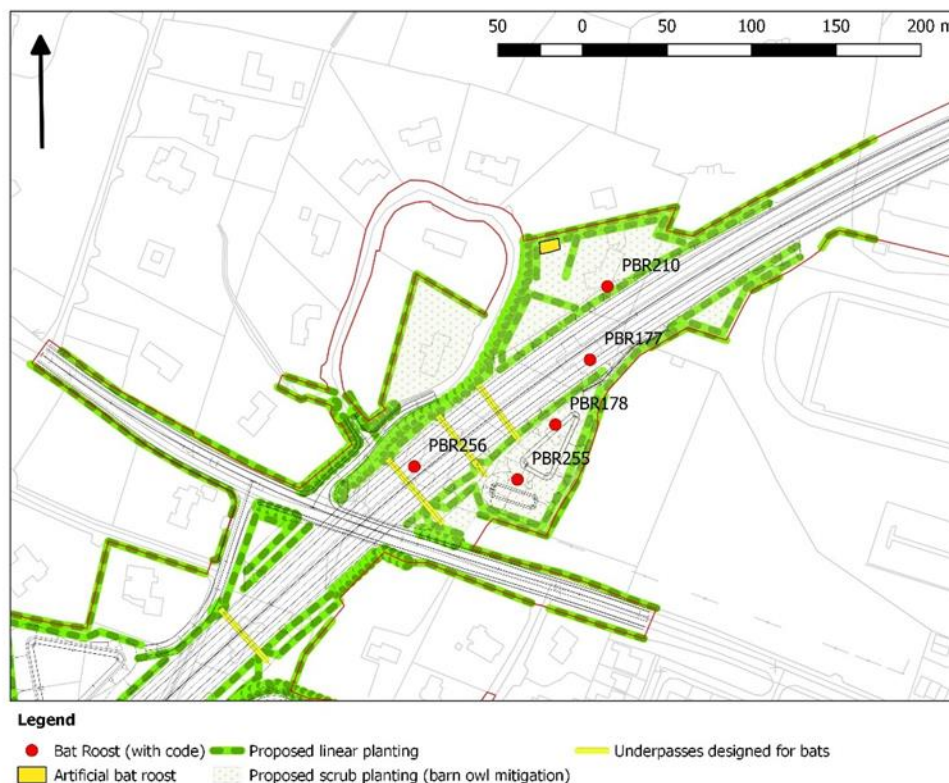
Proposed Location of Aughnacurra Artificial Roost Structure (not to scale)
